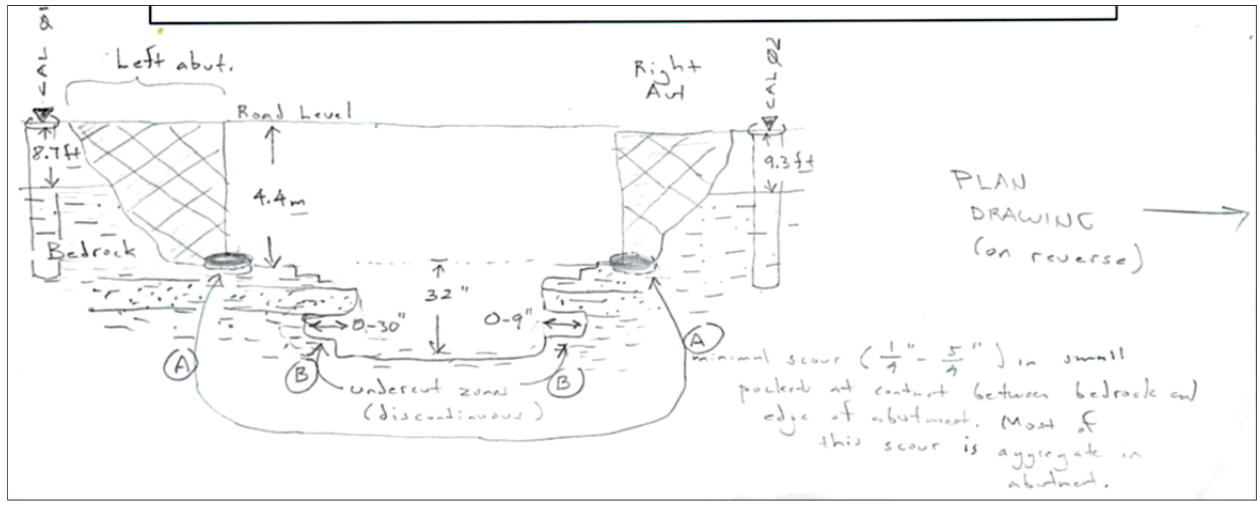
Field sketch of Caldwell Run Bridge, looking upstream.
